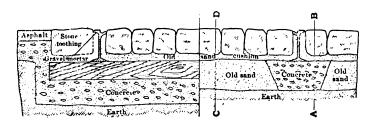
Philadelphia Track Construction Ready for Concrete.
